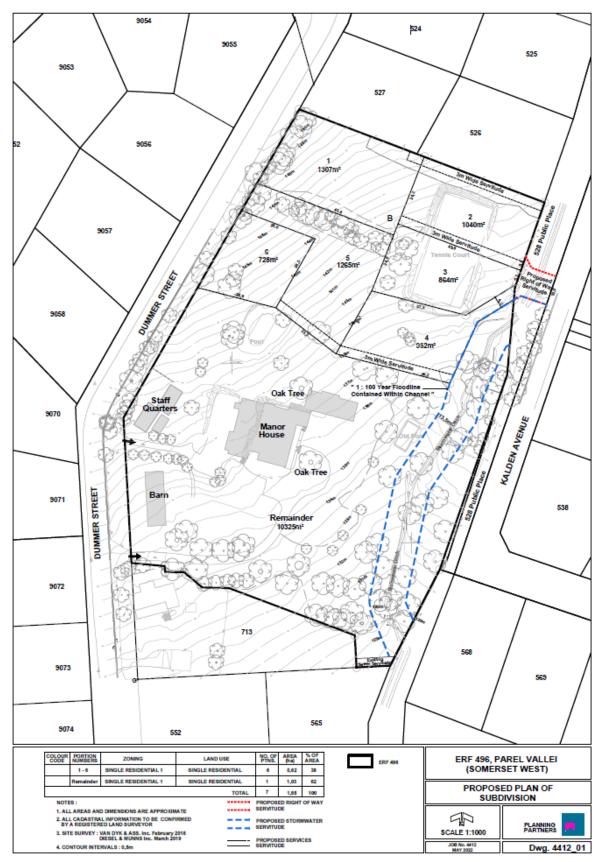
Site development plan of the proposed subdivision of Erf No. 496, Somerset West.
